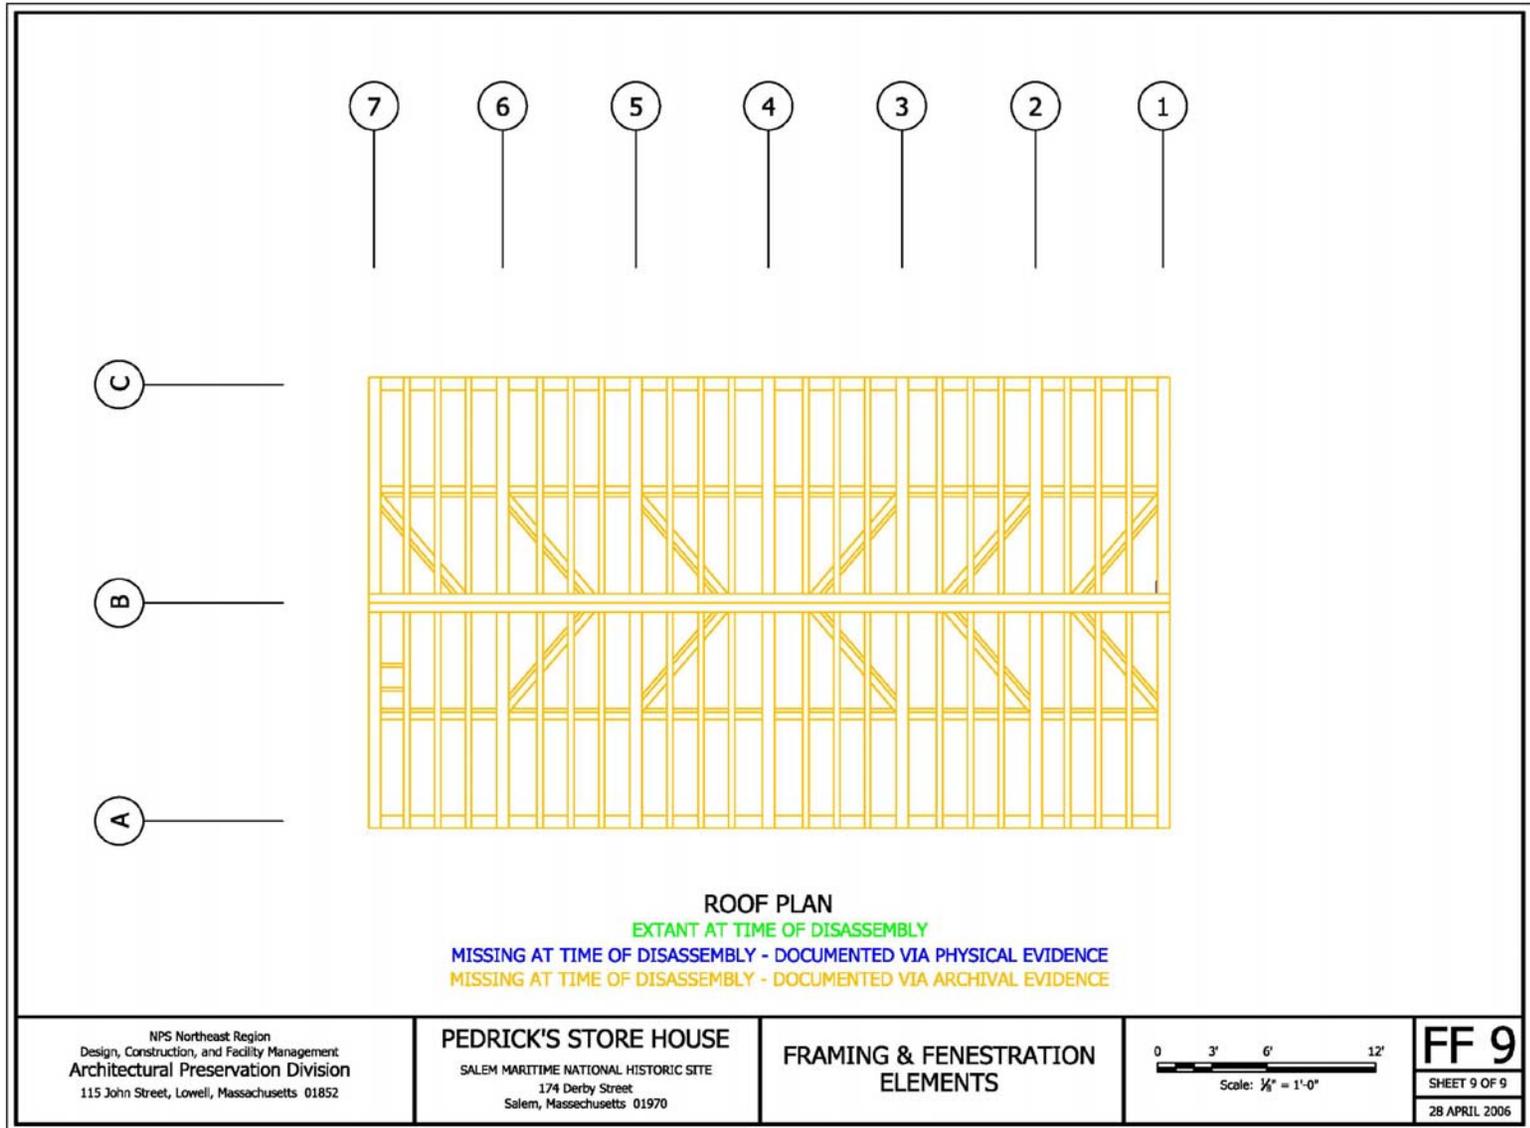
Measured drawing of framing and fenestration elements: Roof plan.
